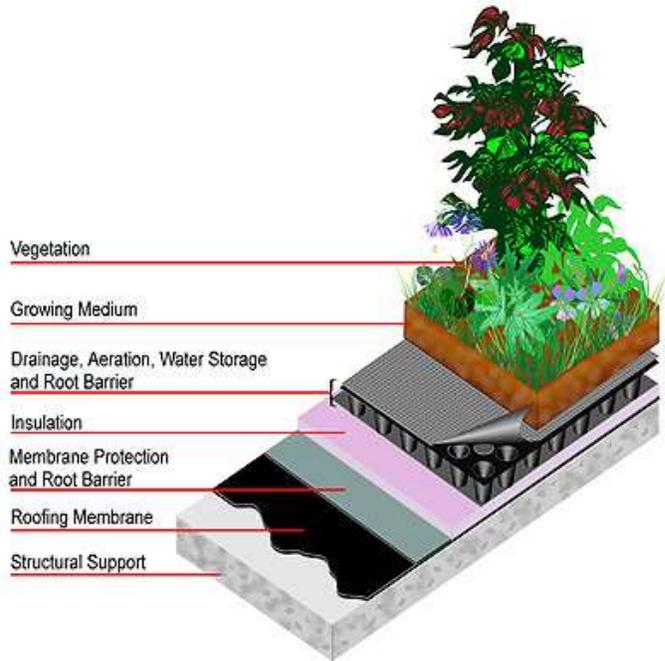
Green roof cross-section. Source: American Wick Drain Corp.
